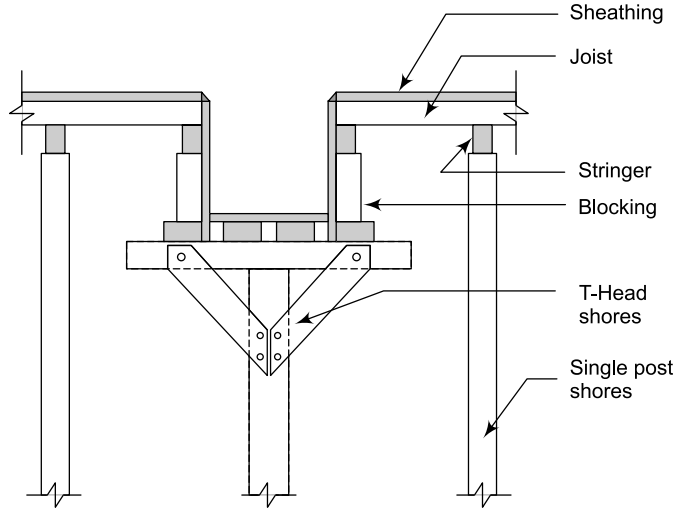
Joining Details of Posts and Beam Bottoms.
